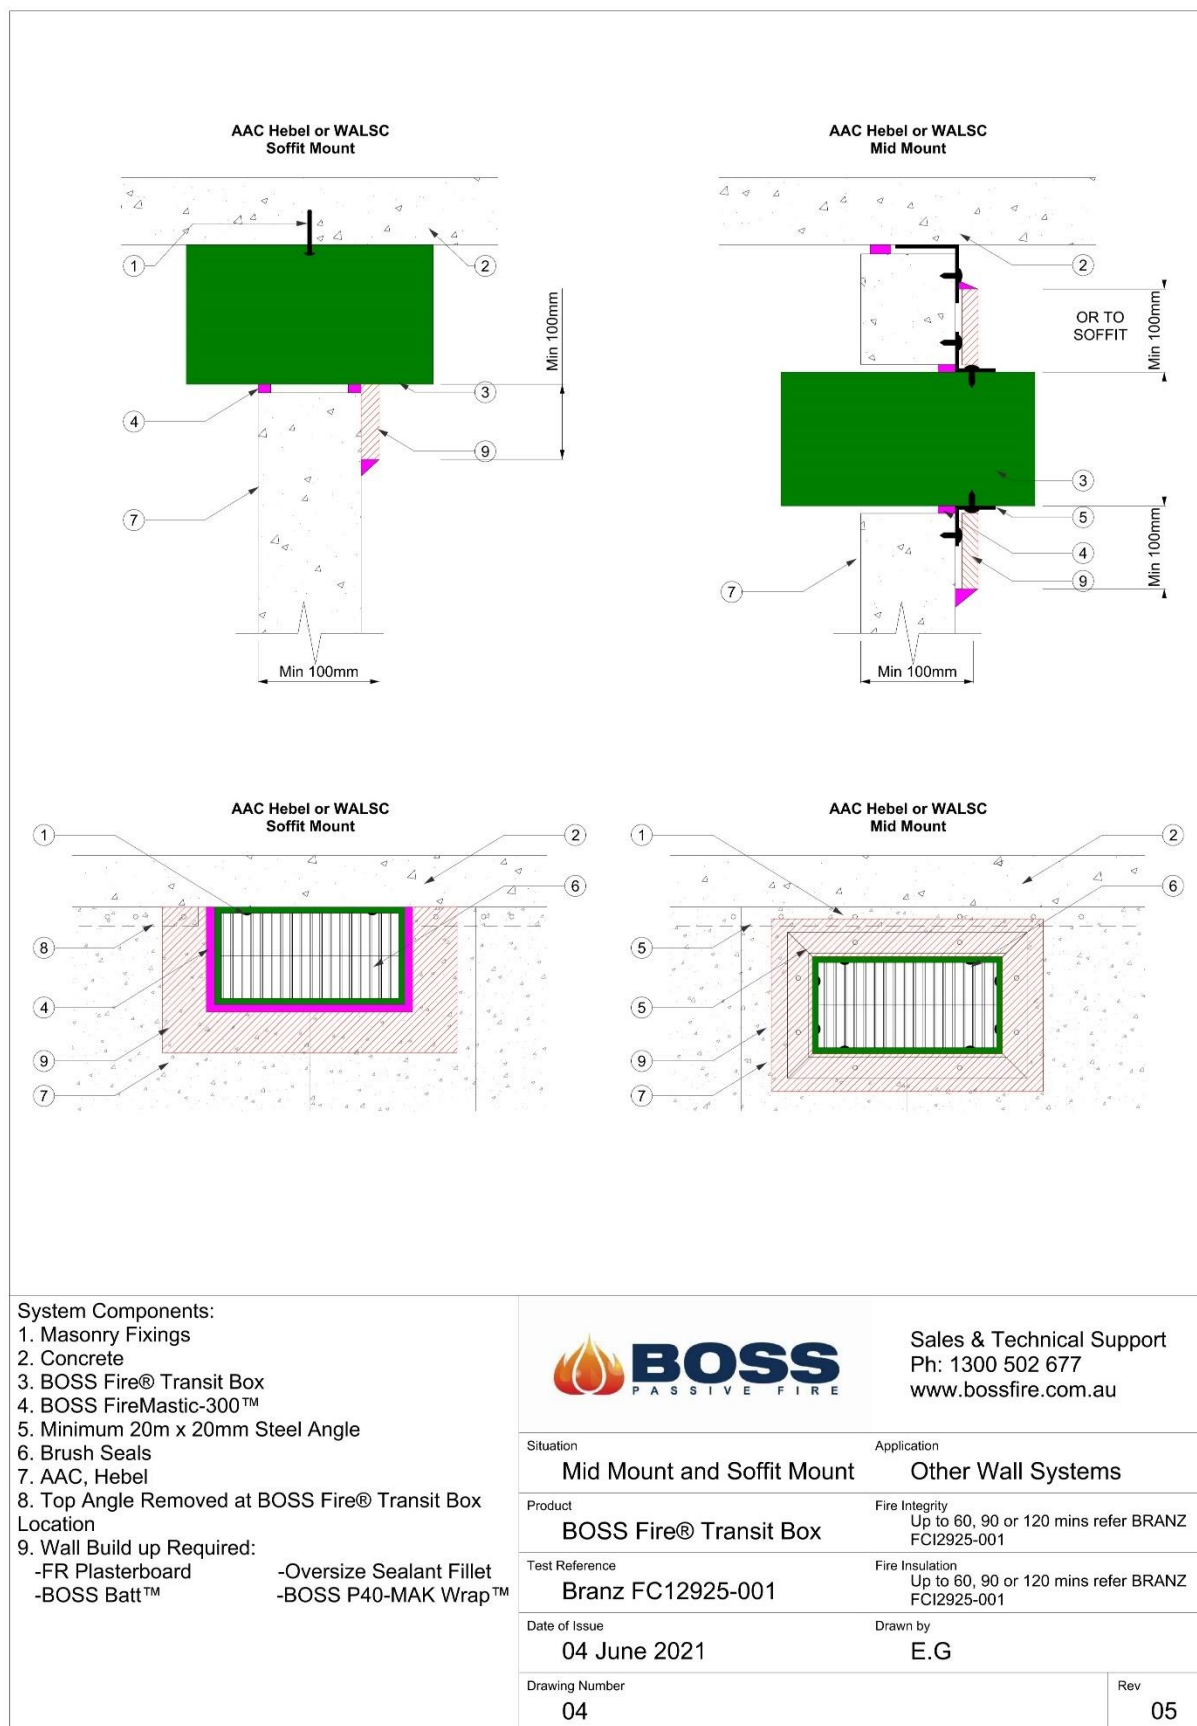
BOSS Fire® Transit Box – Mid & Soffit Mount in Concrete/Masonry Systems
